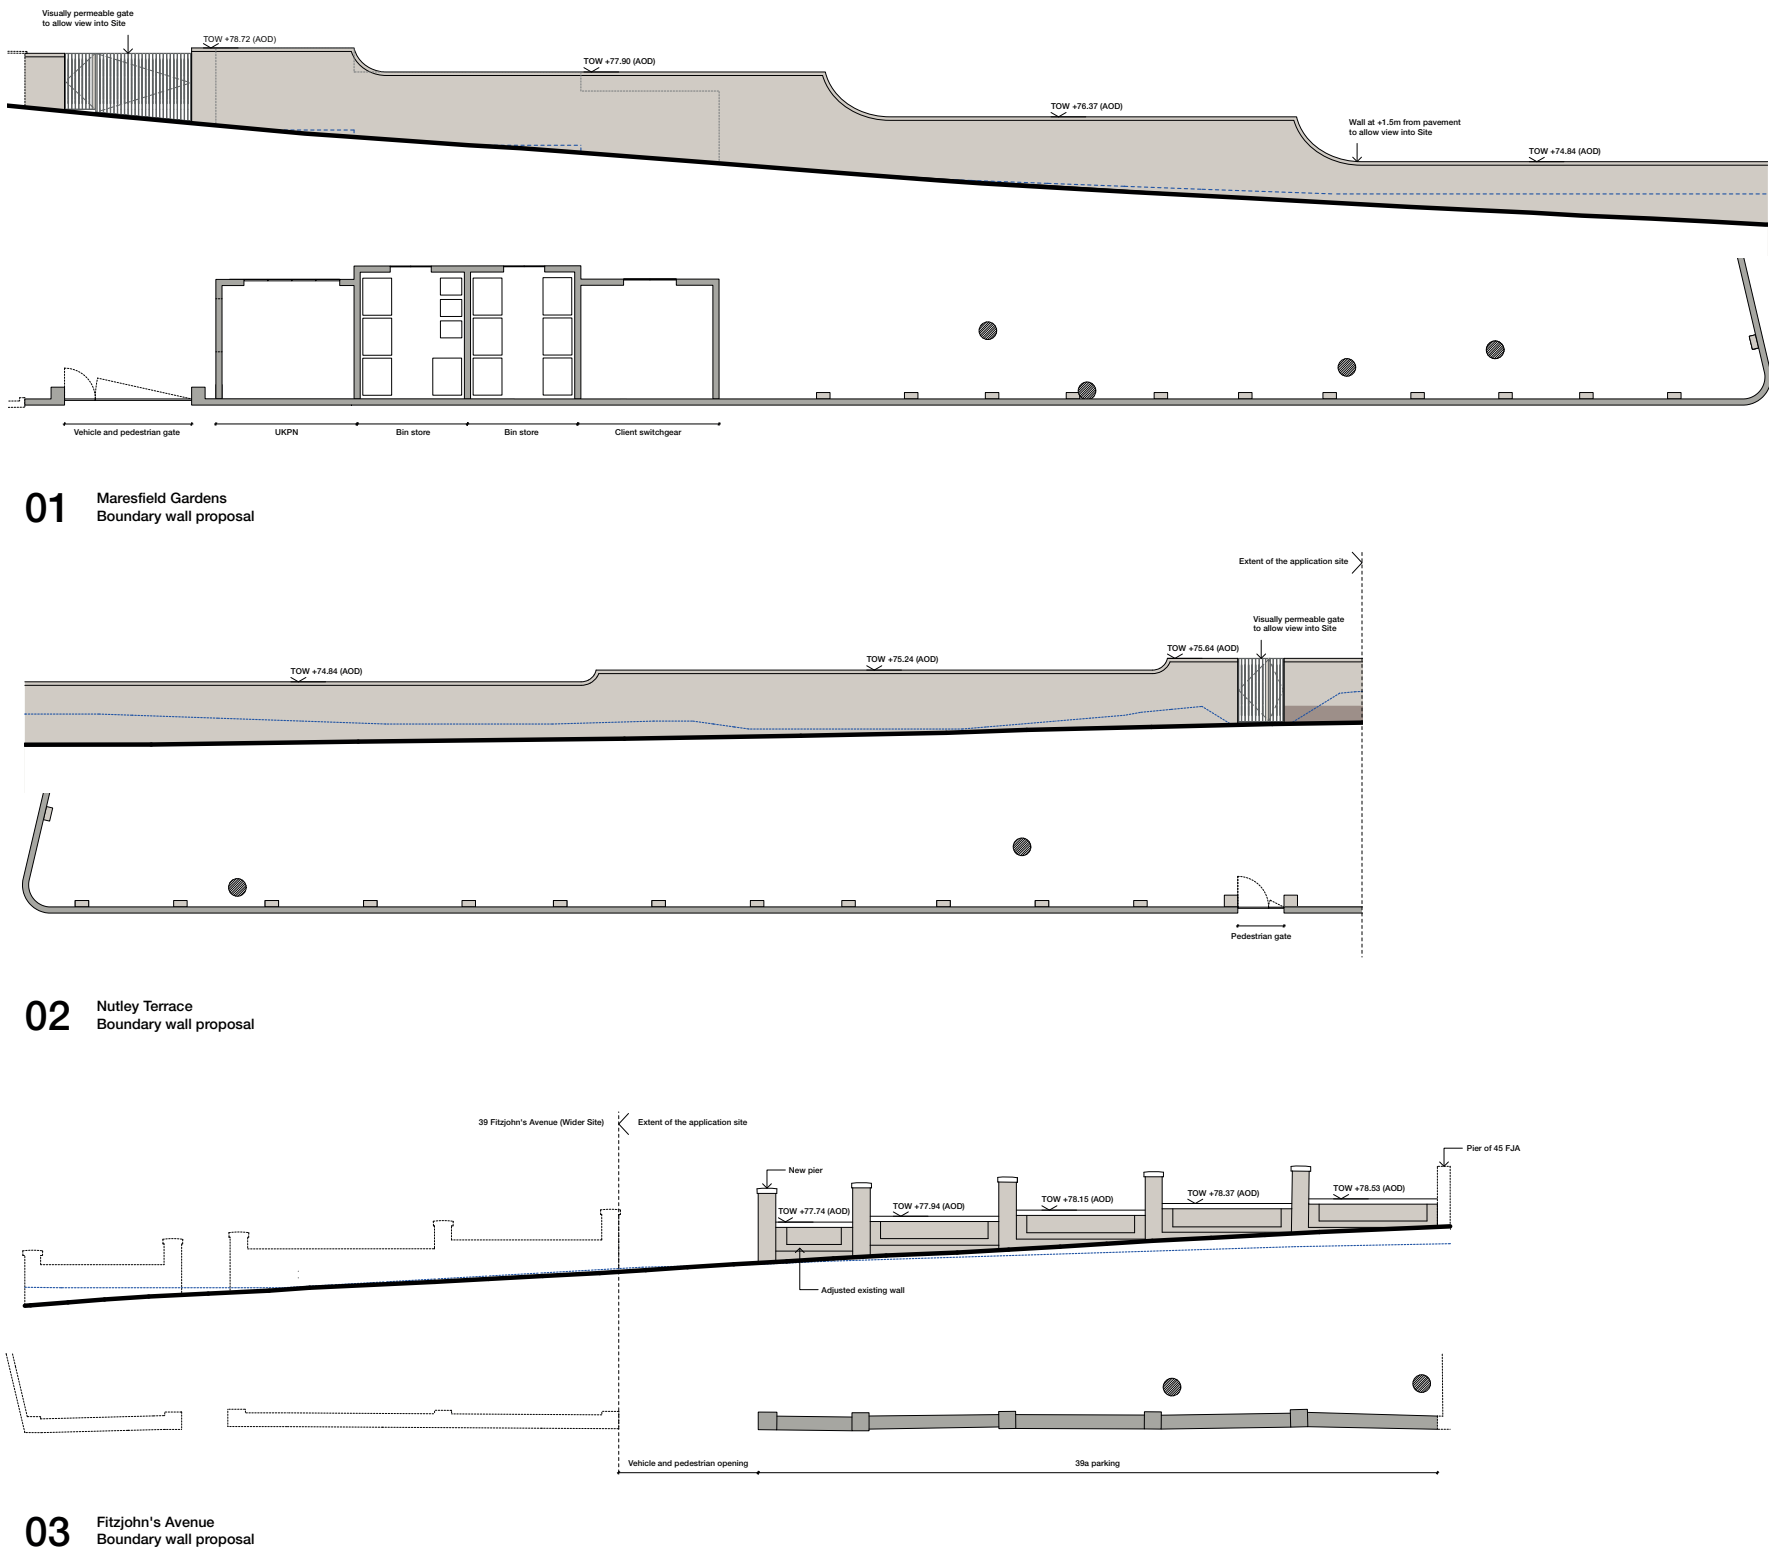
Plan showing proposed boundary treatment works. Source: Sergison Bates Architects.
